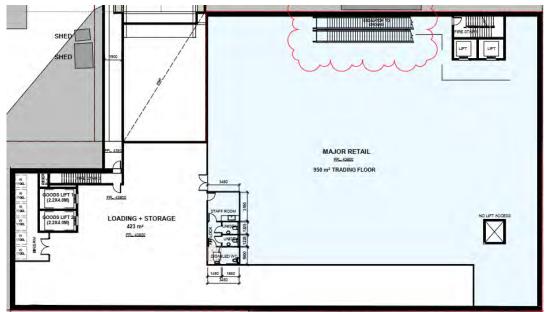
Basement Level 1, Major Retail floor plan. Source: Floor Plan – Basement 1, Drawing No. A0202 prepared by TesserArch dated 09/03/23.
